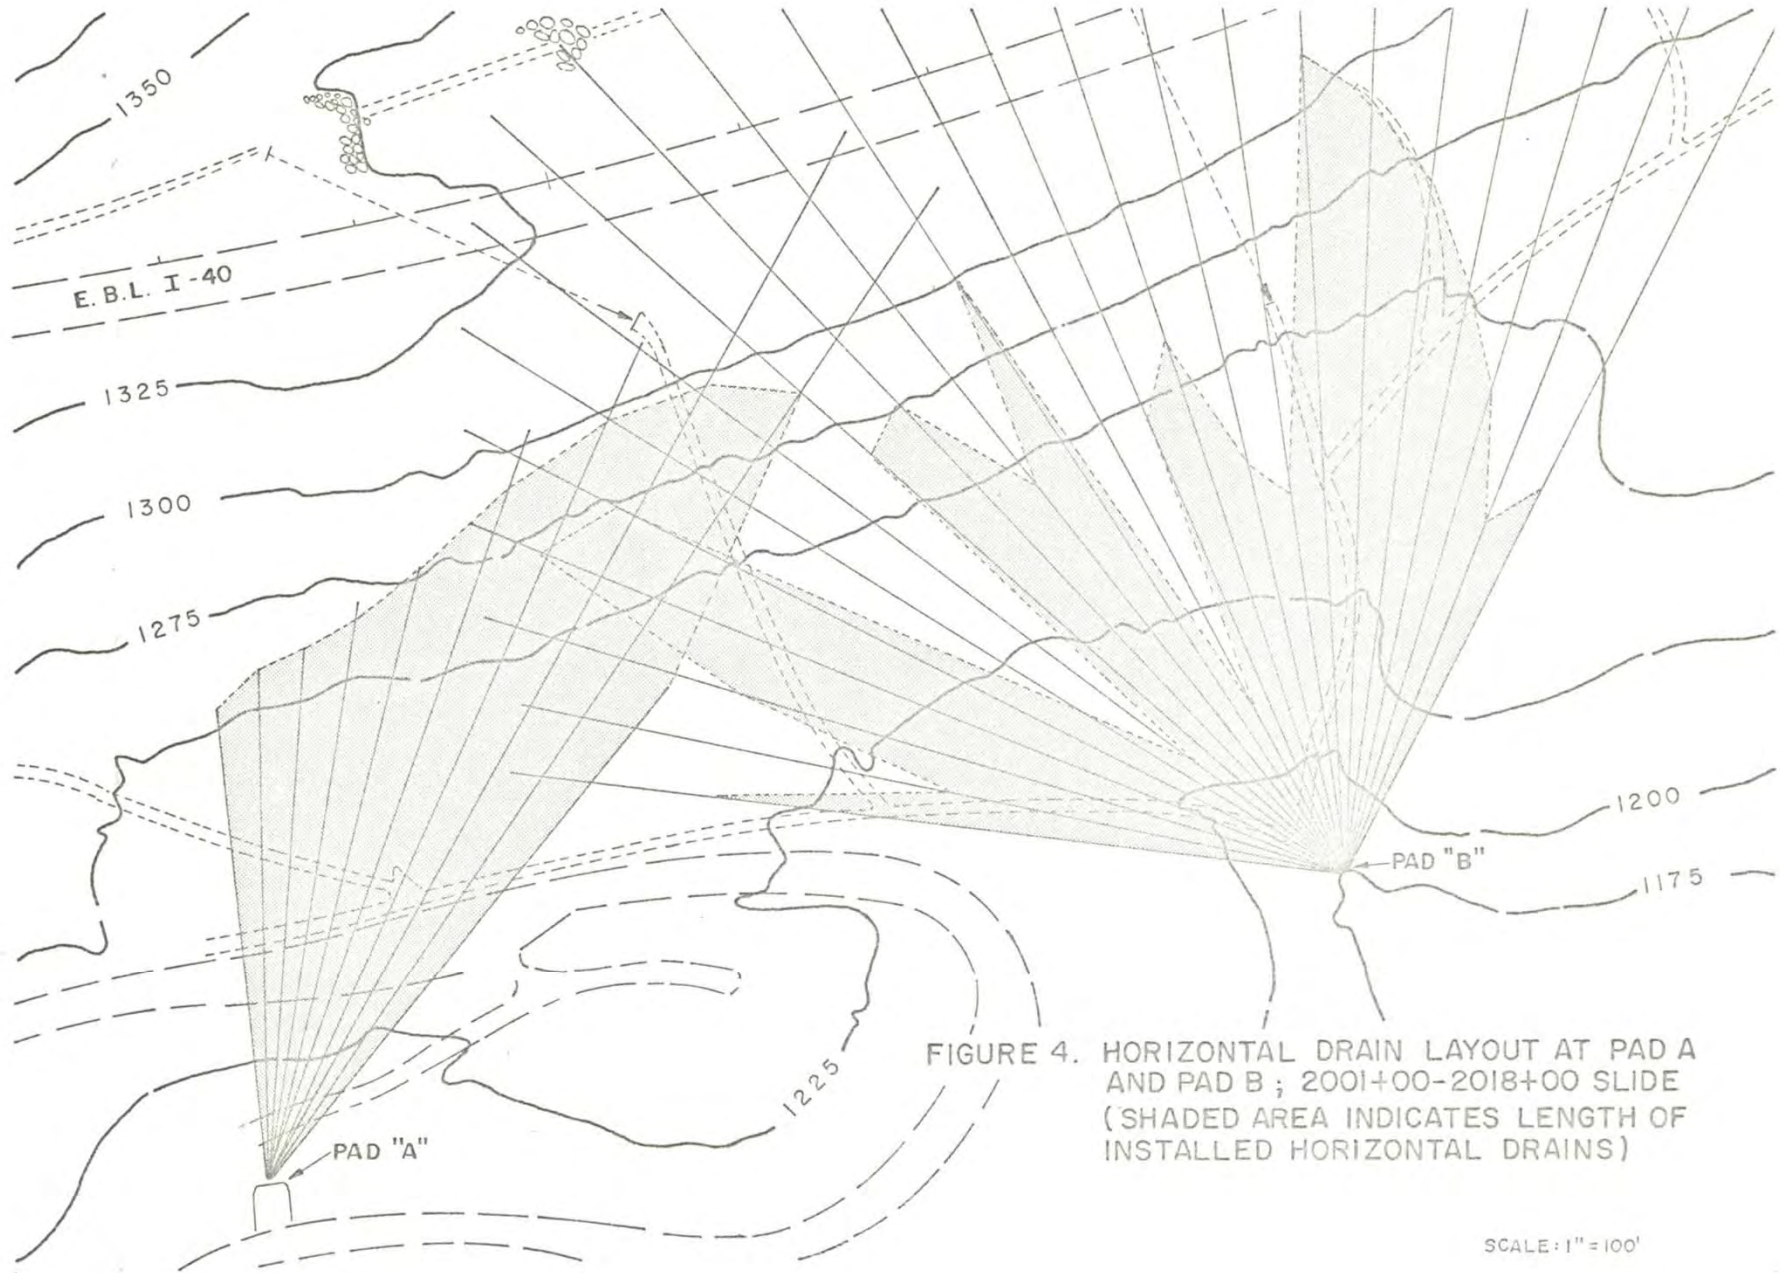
HORIZONTAL DRAIN LAYOUT AT PAD A AND PAD B ; 2001+00-2018+00 SLIDE (SHADED AREA INDICATES LENGTH OF INSTALLED HORIZONTAL DRAINS)
